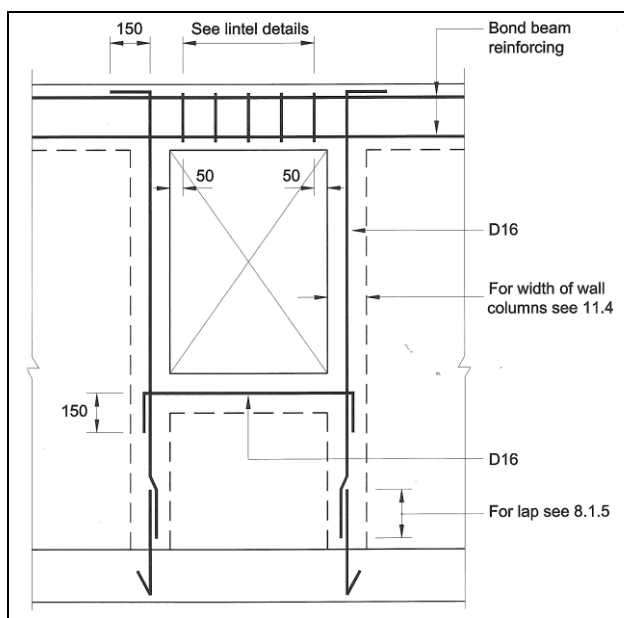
Reinforcement Above and Below Openings (Figure 8.1, NZS 4229)
